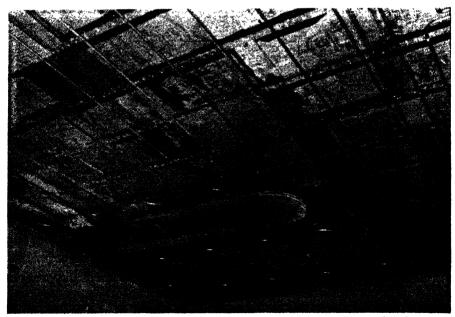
Insulated ceiling construction. (Chase Brass & Copper Co., Inc.)
